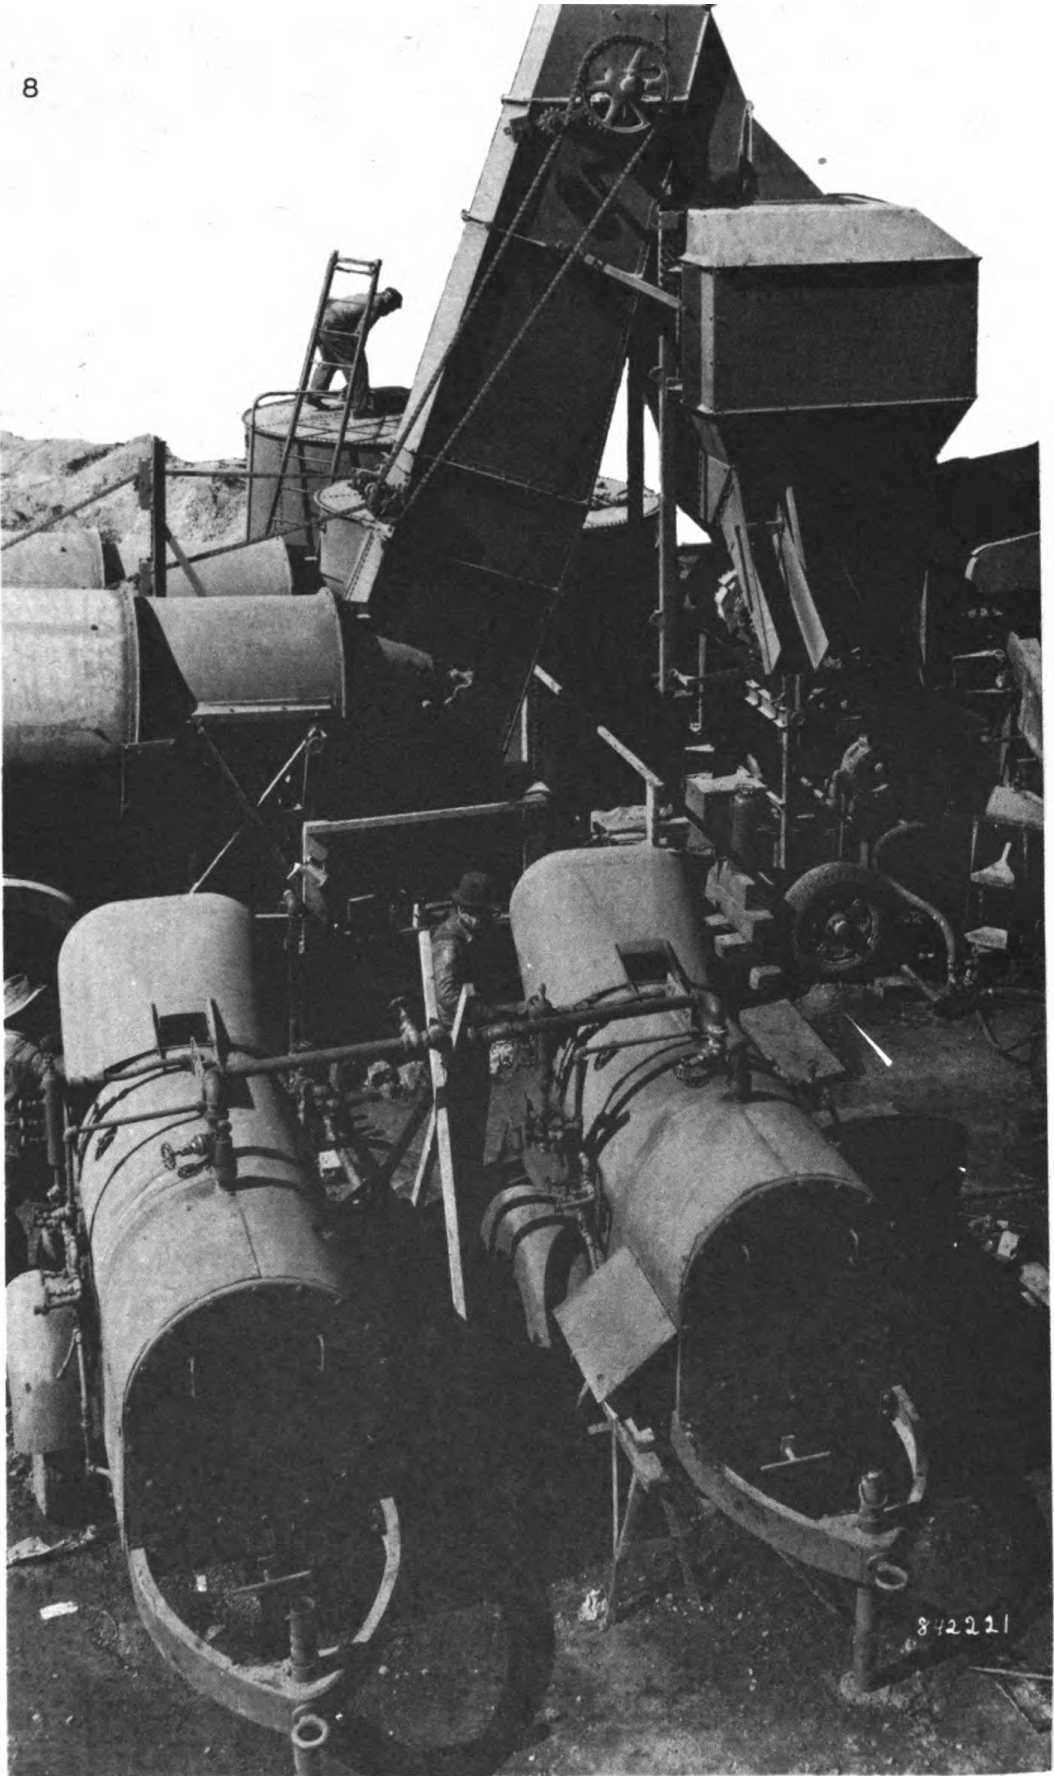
ENCLOSED ELEVATOR FOR ELEVATING
